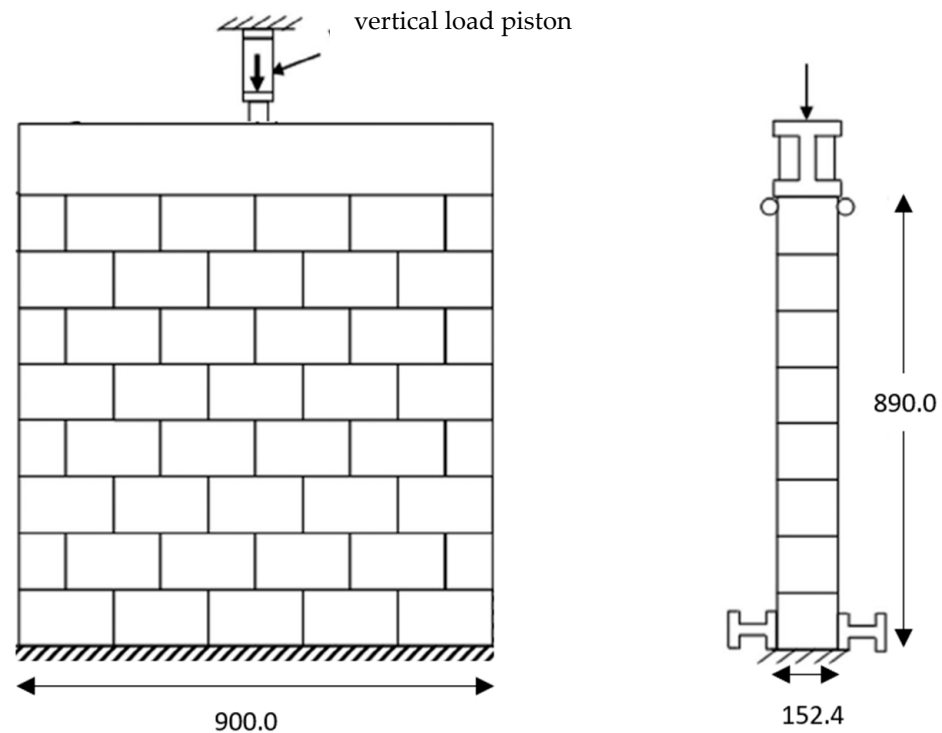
Schematic diagram of the compressive test set-up of the plastic-bonded sand interlocking block wall panels. All dimensions are in mm.
